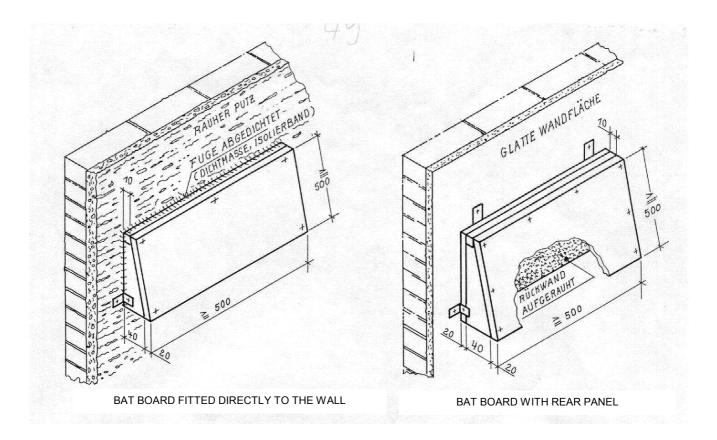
Left: bat board fitted on the house wall. Important: The wood must be rough-sawn on the inside.
